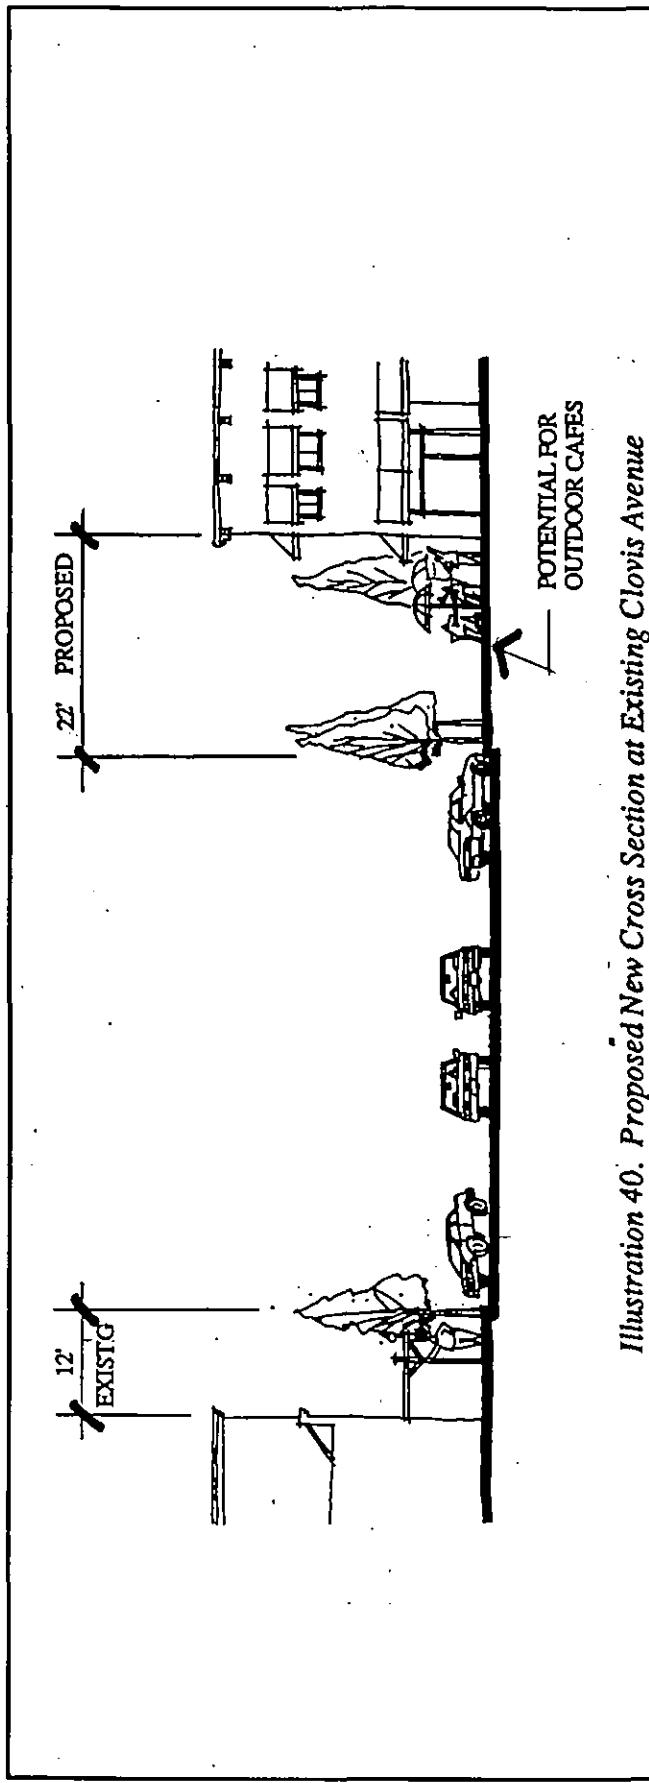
Proposed New Cross Section at Existing Clovis Avenue
